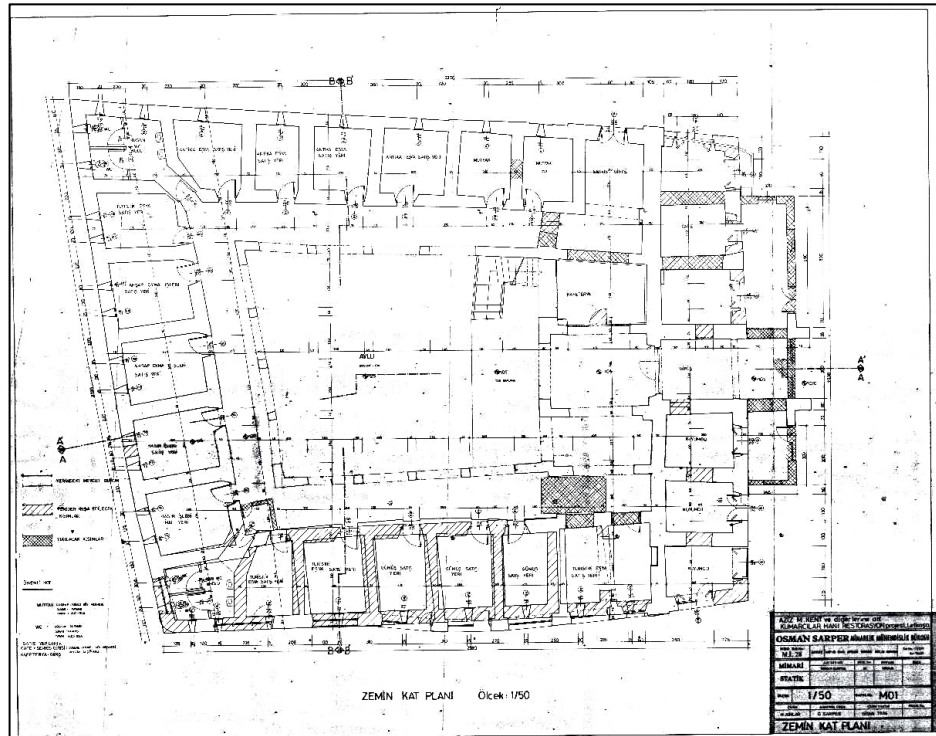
Ground Floor Plan drawing of Kumarcılar Hanı.
